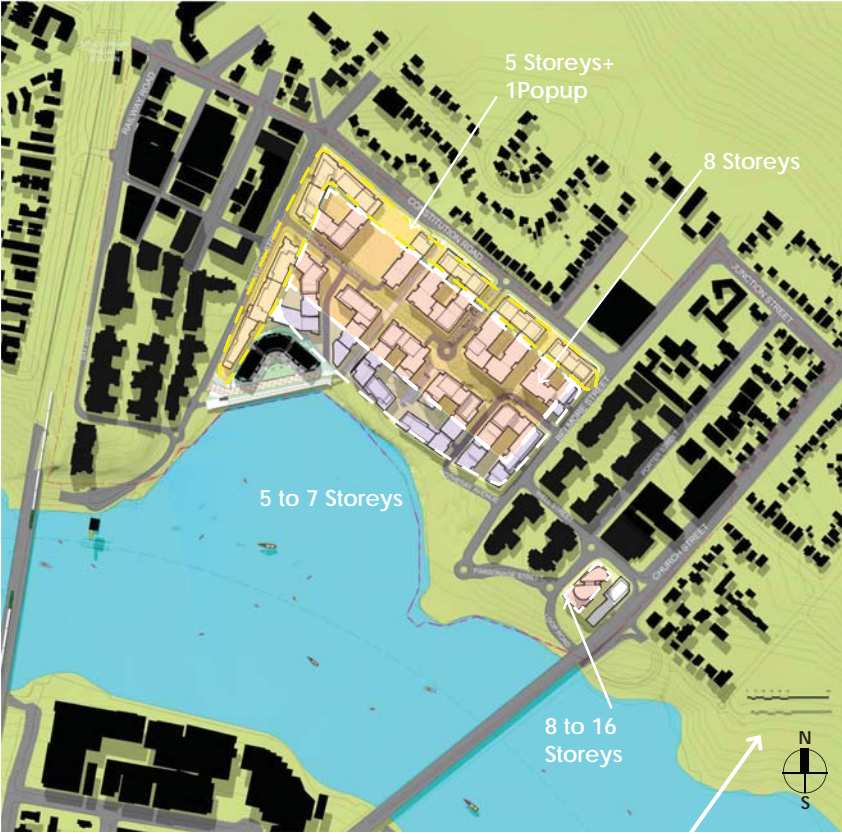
OPTION 1 - BLOCK CONCEPT PLAN
